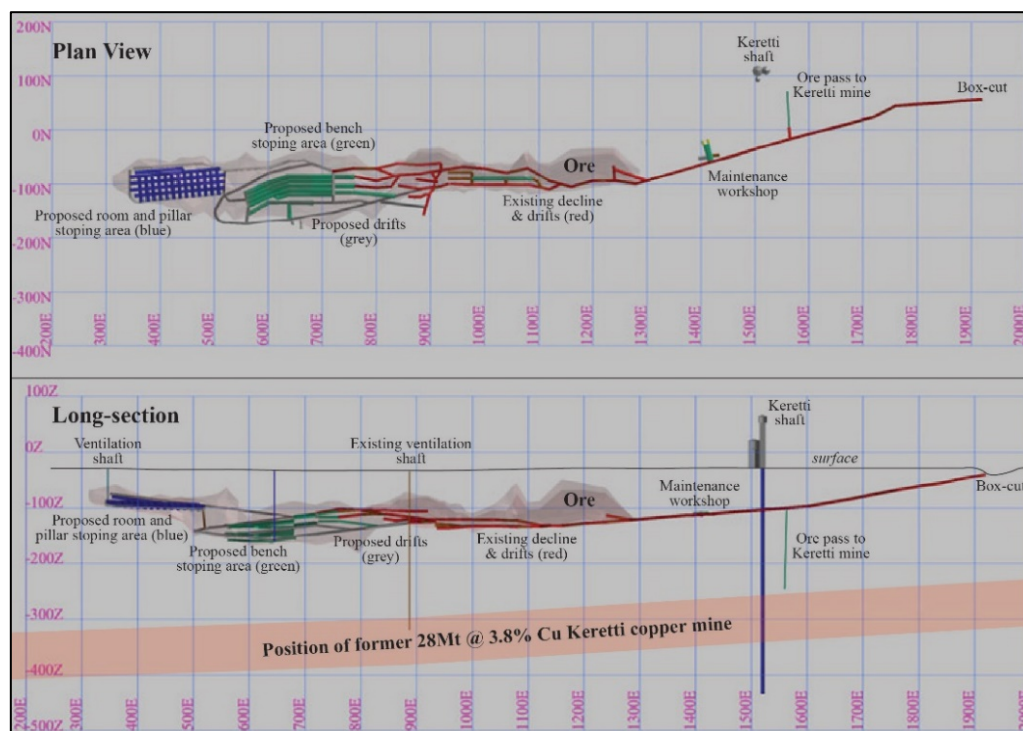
Plan view (top) and long-section (bottom) of proposed mining plan.
